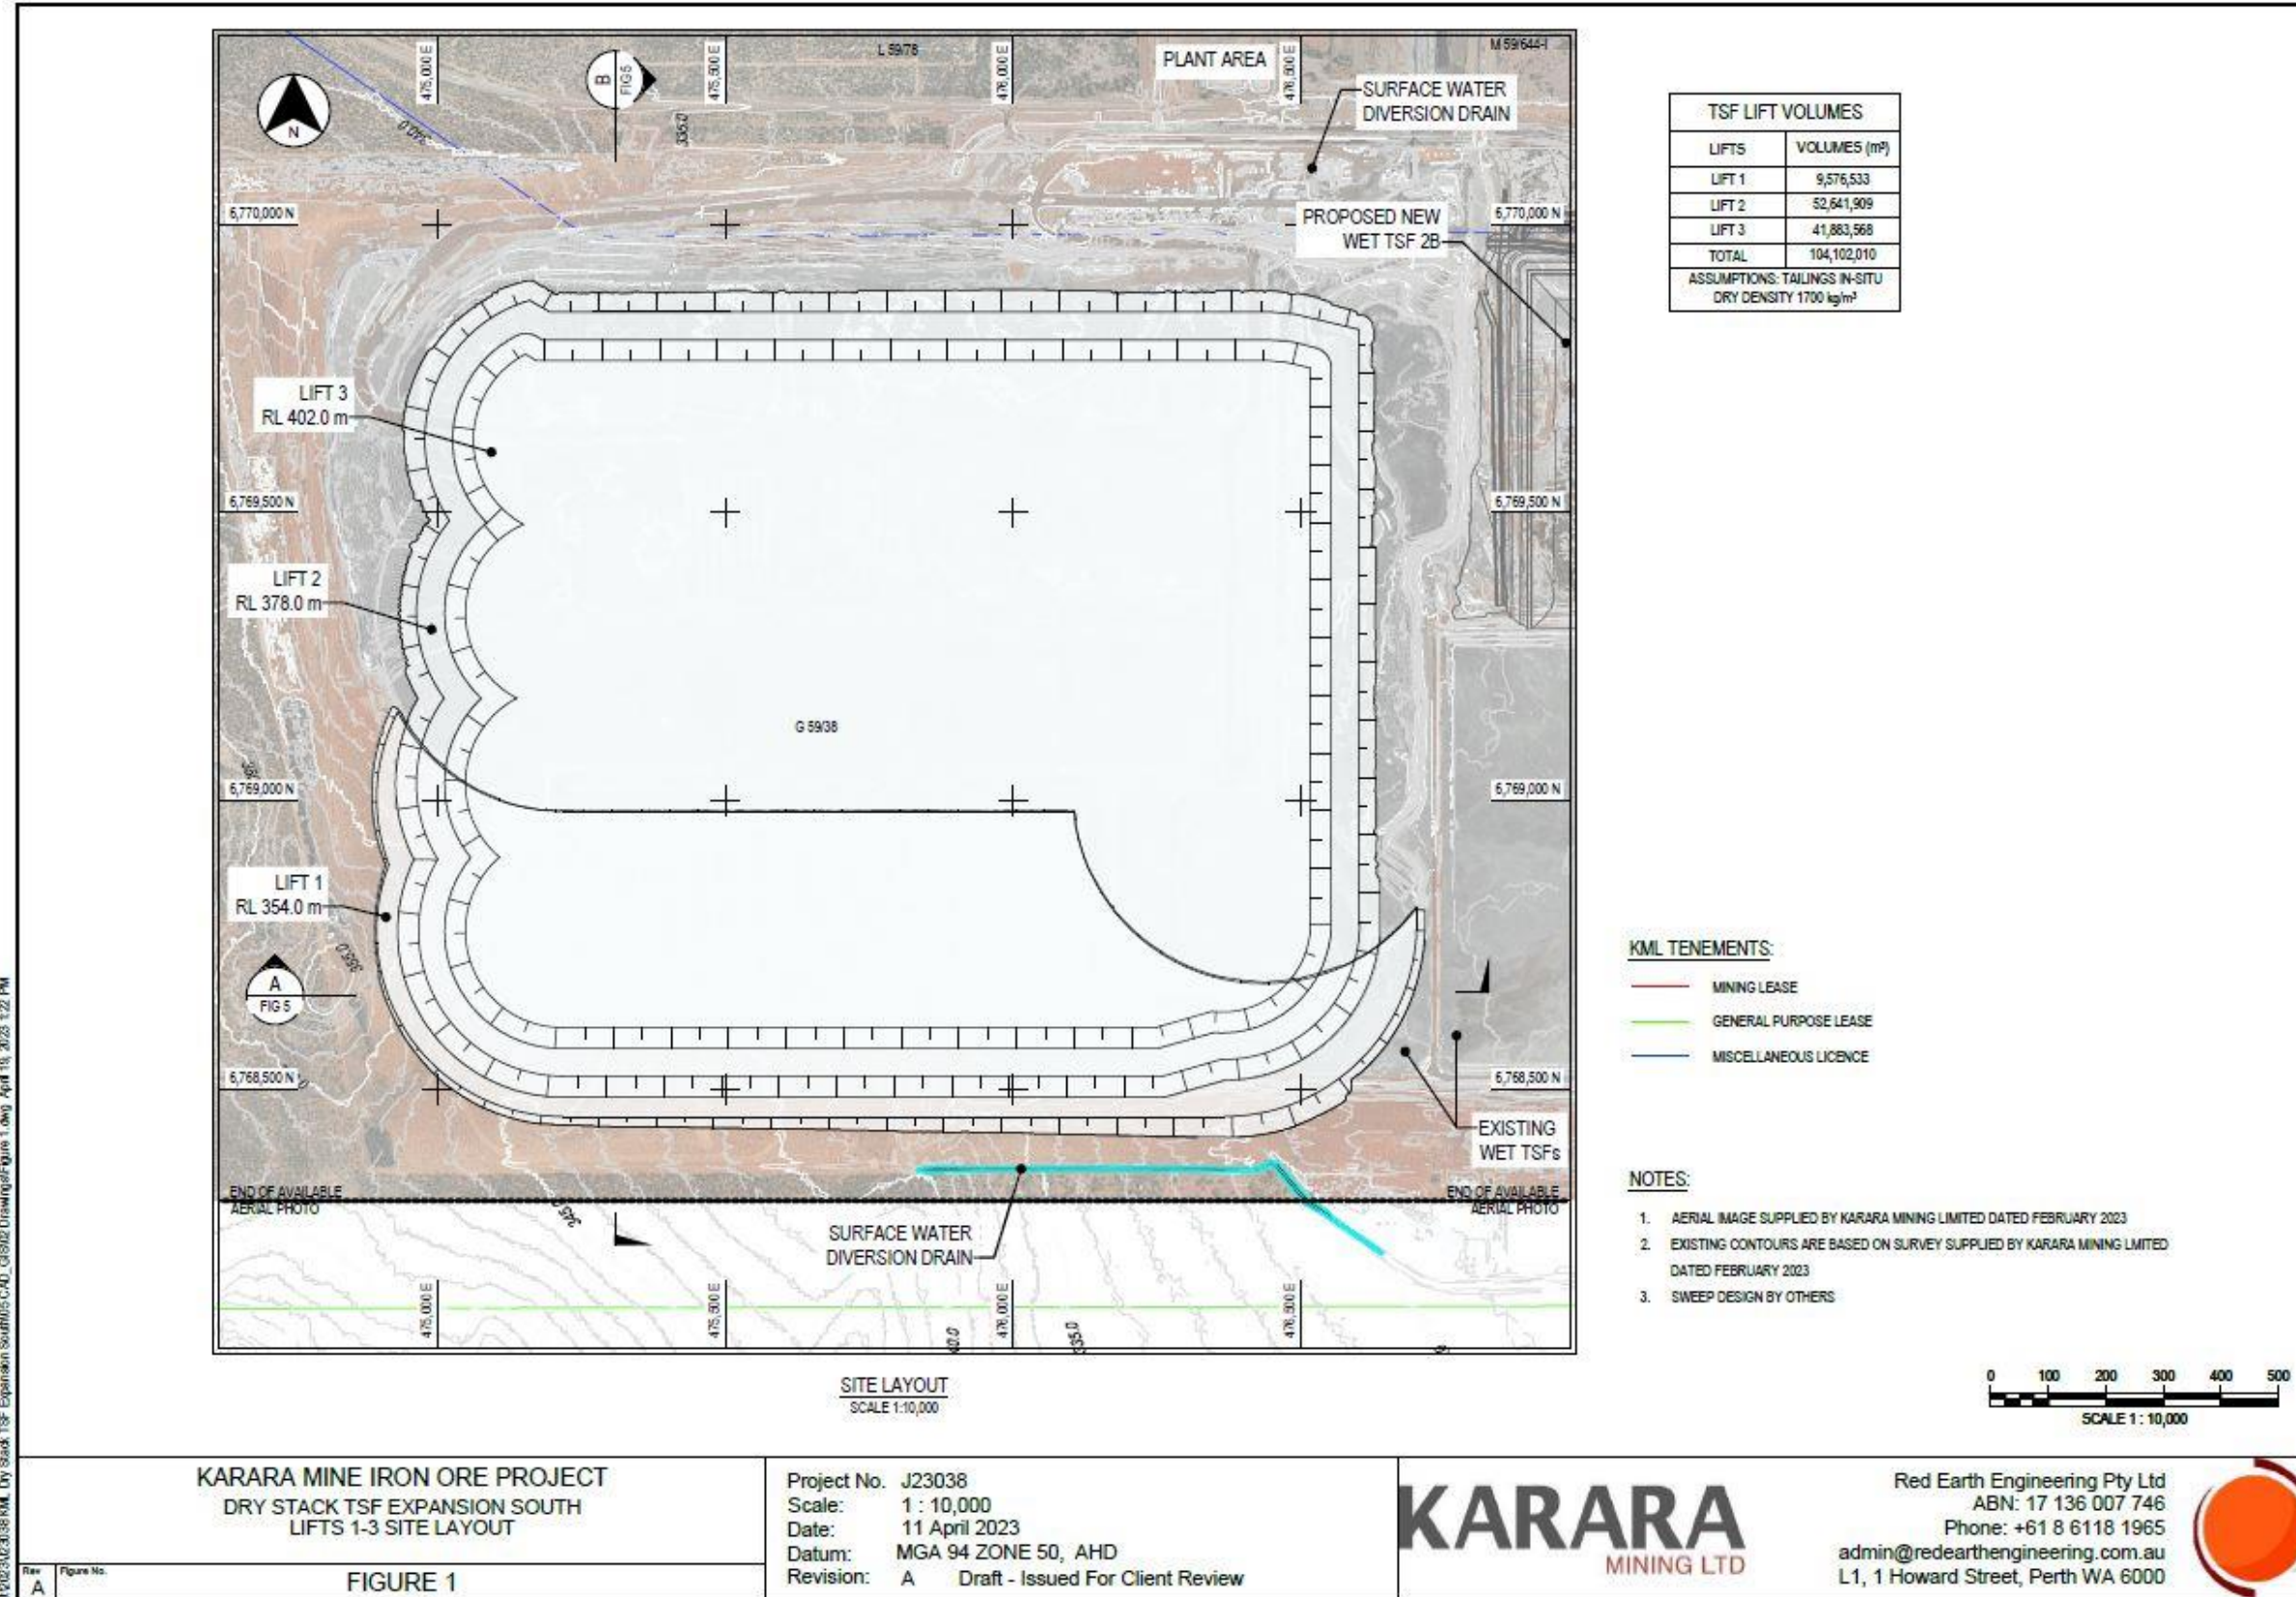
The layout of the Dry Stack TSF Expansion South Lifts 1-3
